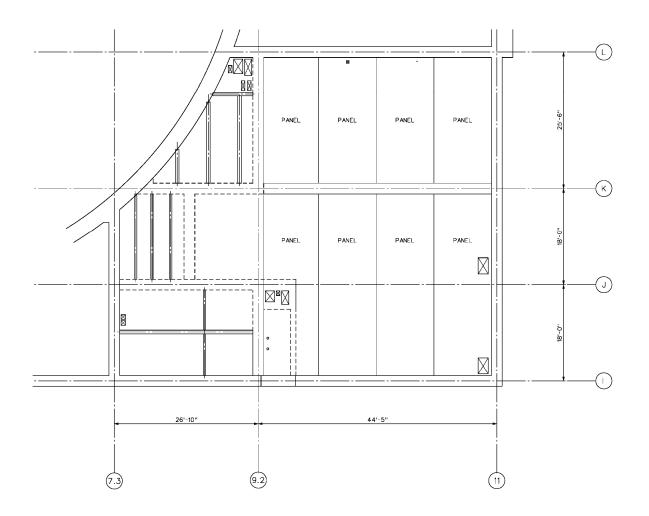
H.5-9 (Sheet 1 of 3) [Auxiliary Building Finned Floor]
